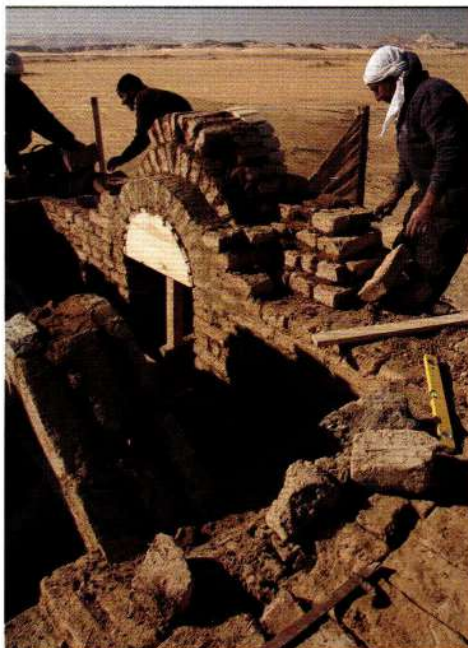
Bricklayers working on the upper section of the reconstructed north wall. Photo by N. Warner, ©NKOS
